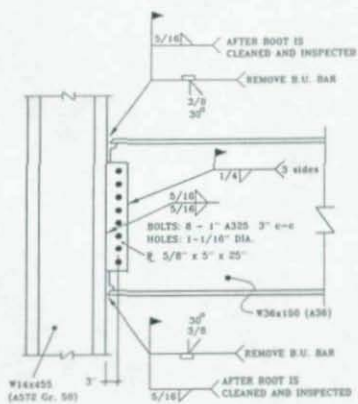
SPECIMEN 1 CONNECTION DETAIL
